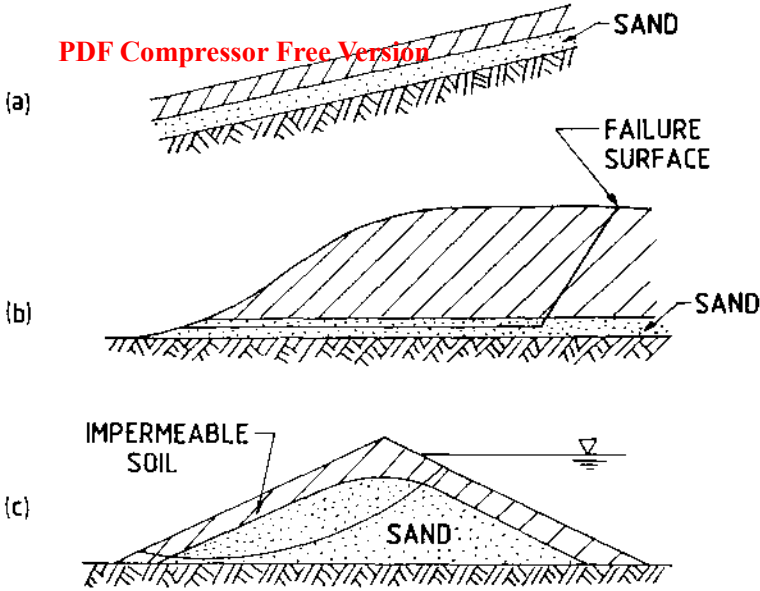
Examples of situations involving the existence of significant shear stress in the soil: a) sloping ground; b) embankment on level ground; c) earth dam.
